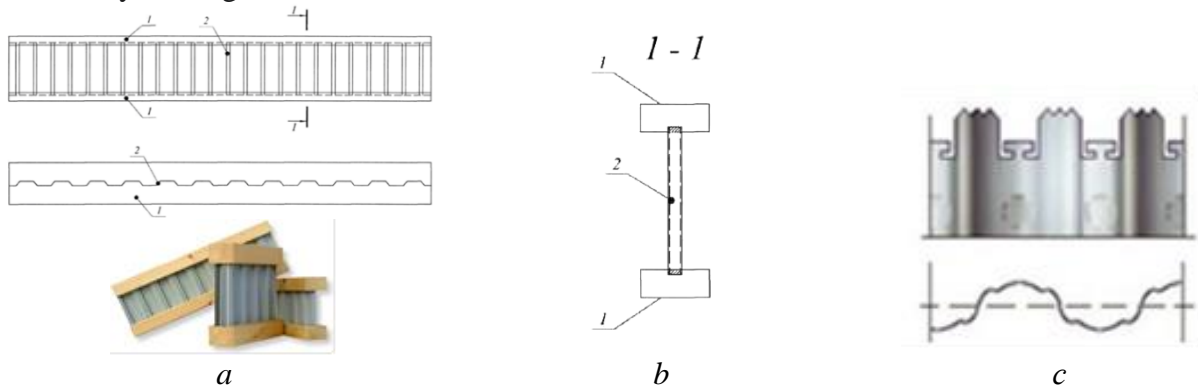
Construction of metal-and-timber I-beam: a – general appearance; b – cross-section; c – shape of the corrugated wall teeth for pressing into the wood belt.
